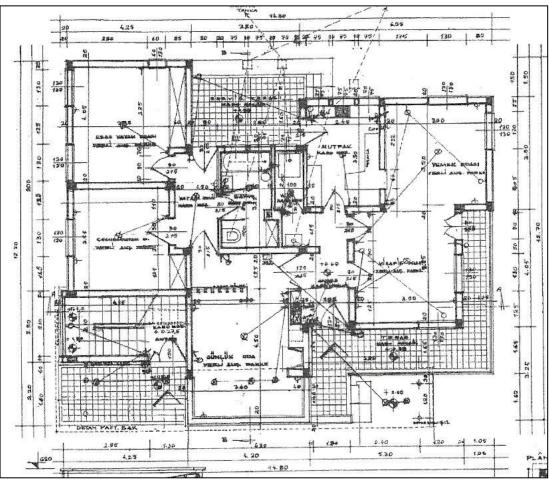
Tangül Family Residence Project Floor Plan (Feridun & Feridun, 2013).
